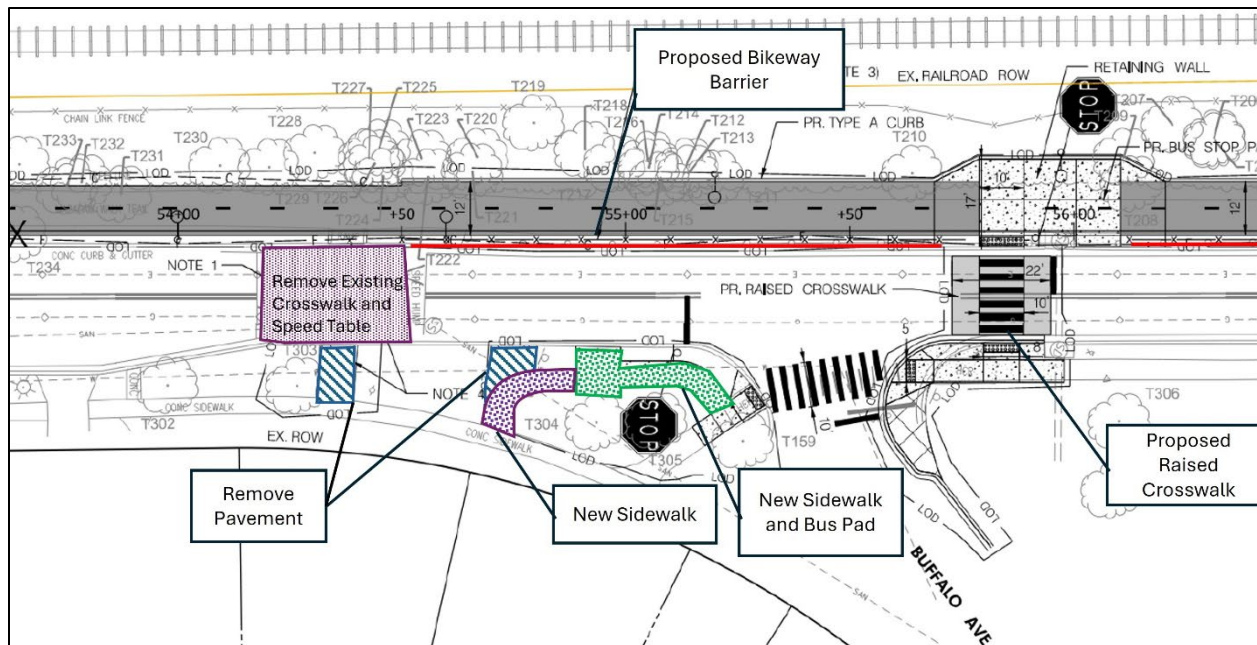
Proposed Sidewalk Connection to Buffalo Avenue Bus Stop
